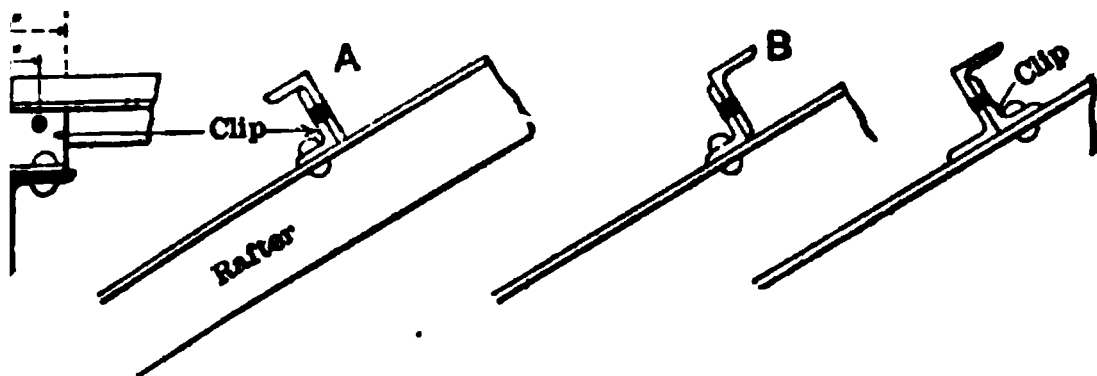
Purlin-connections. Steel Clips, Angles and Z Bars
